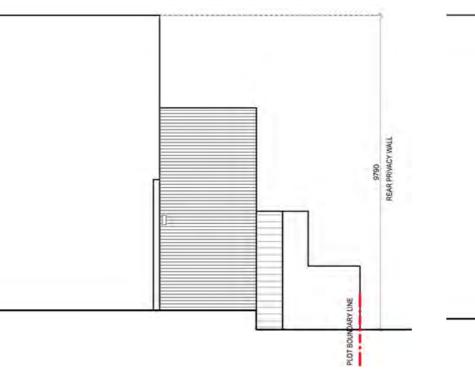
Right Elevation (Canal side) showing boundary wall for 5.4 / Layl Applicable for Outer Canal Villas
